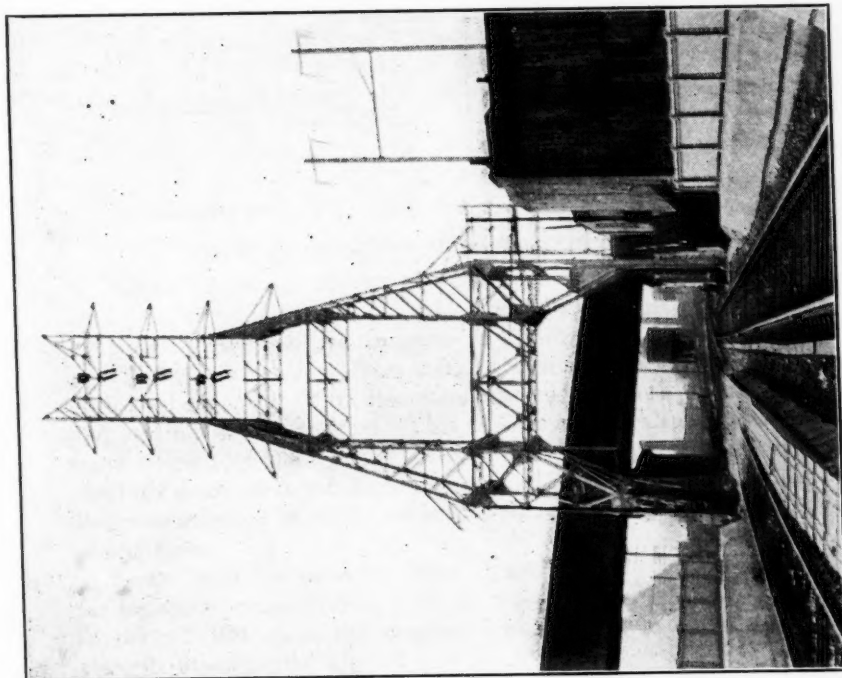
TYPE V BRIDGE STRUCTURE.
